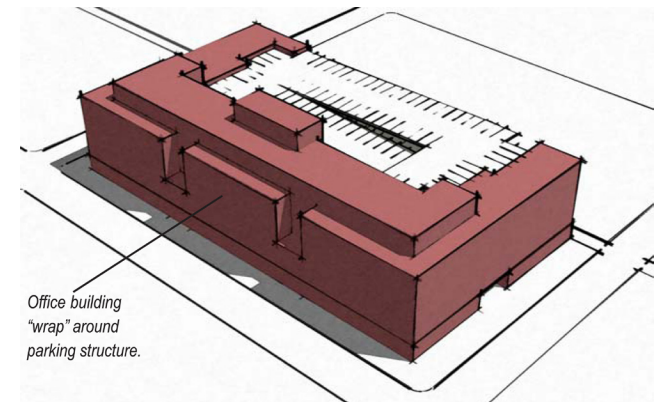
Building wraps around a parking structure (Source: Rendered by Adam Krom, Wallace, Roberts and Todd, Plan for Peoria, Illinois)
